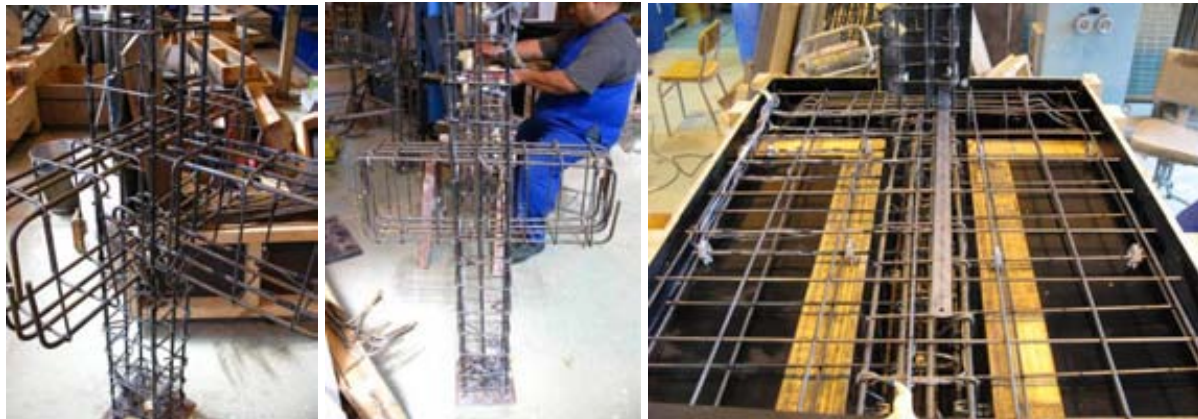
Reinforcing cage and details for test units with slabs – SL-O1 and SL-R3.
